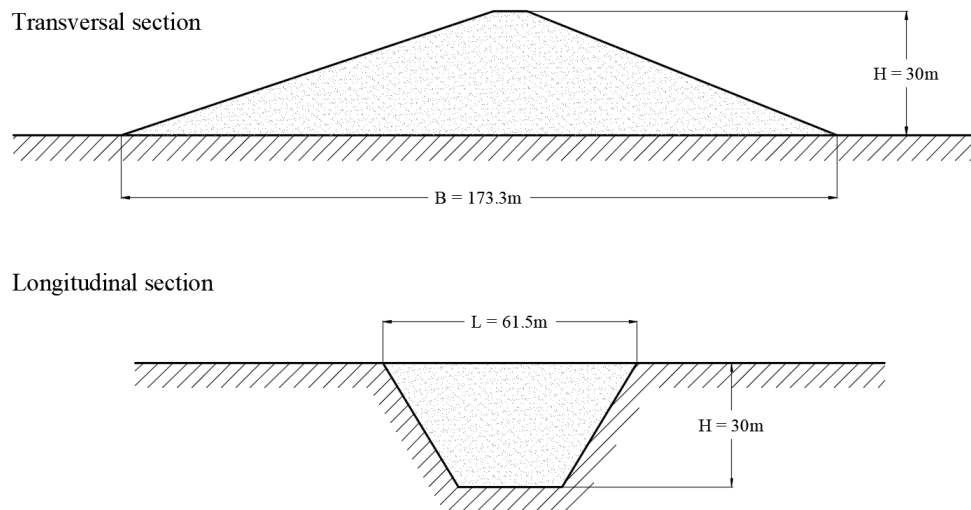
Simplified homogeneous trapezoidal earth dam; above: transversal section and below: longitudinal section.
